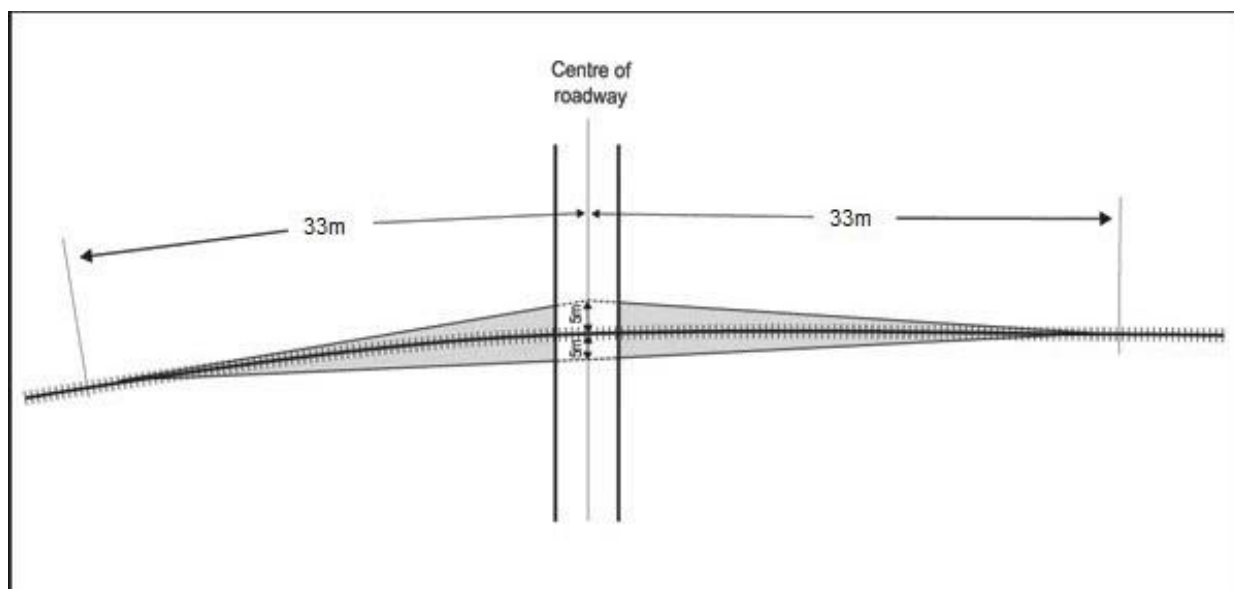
Restart sight triangles for public road/rail siding level crossings
